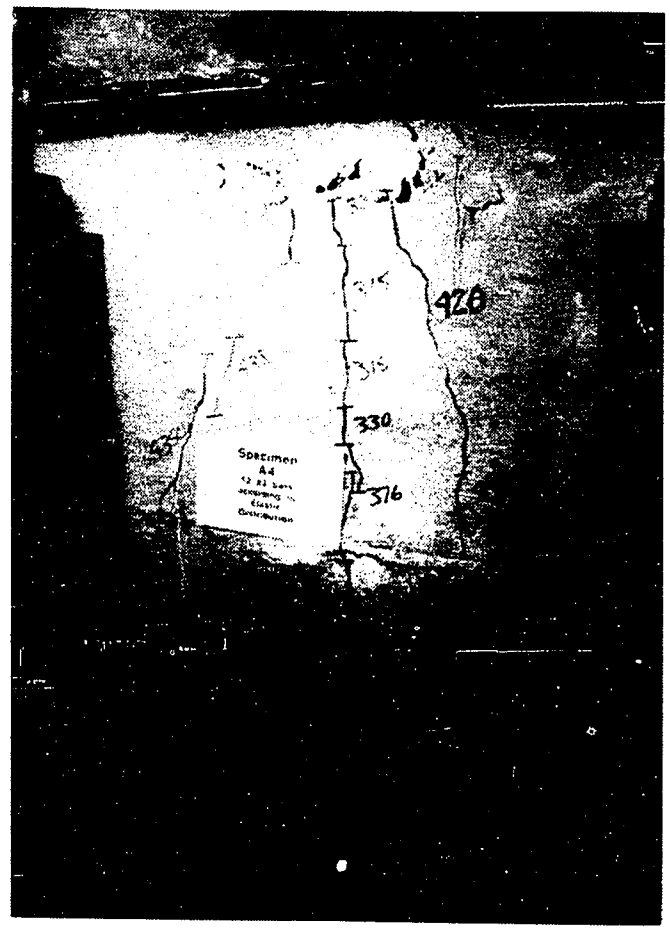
Specimen A4 Crack Pattern at Ultimate
